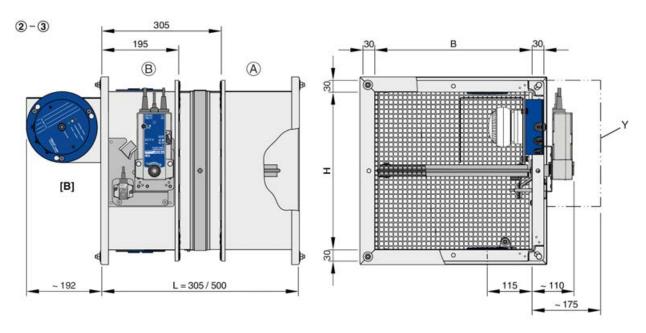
FKA2-EU with spring return actuator and duct smoke detector as air transfer damper – variant with bracket on the drive side, top right (shown for sizes 2 and 3)
